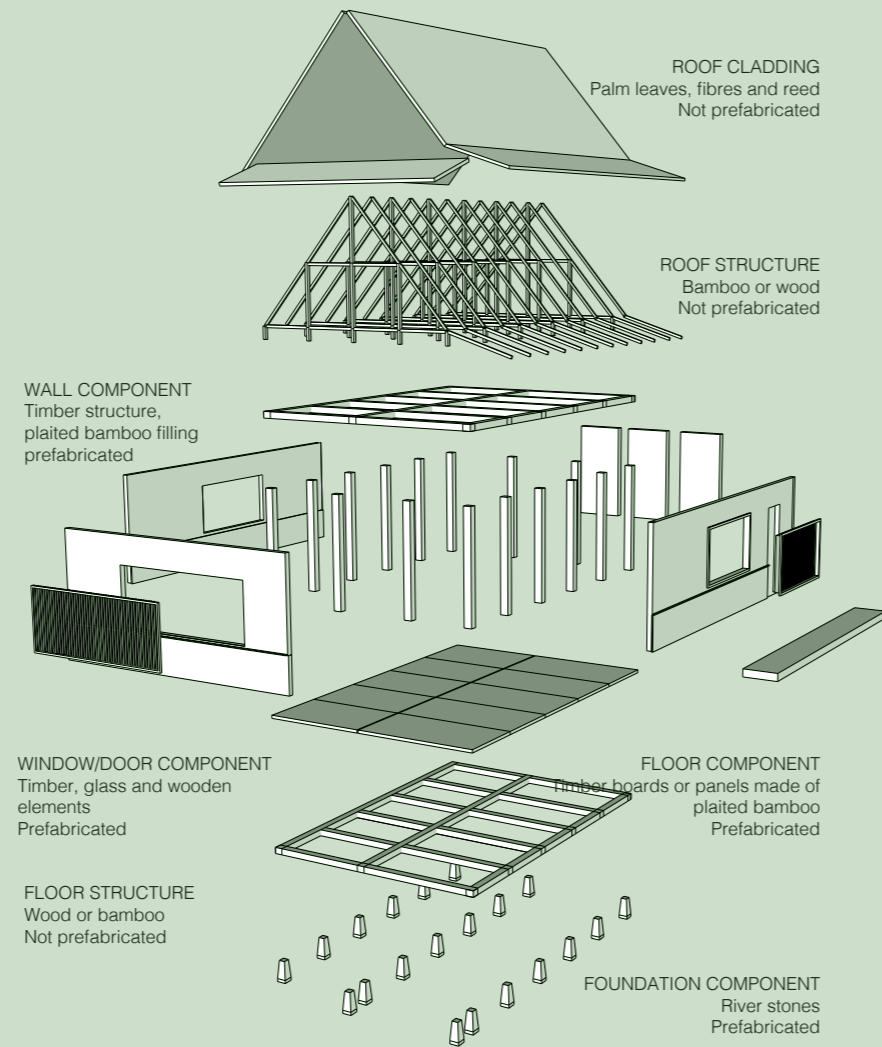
EXPLODED VIEW OF BUILDING COMPONENTS AND MATERIALS OF RUMAH PANGGUNG
